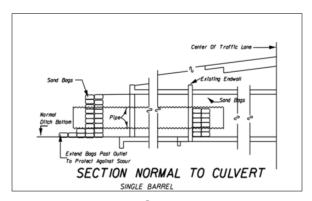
Section Normal to Culvert (Single Barrel)
